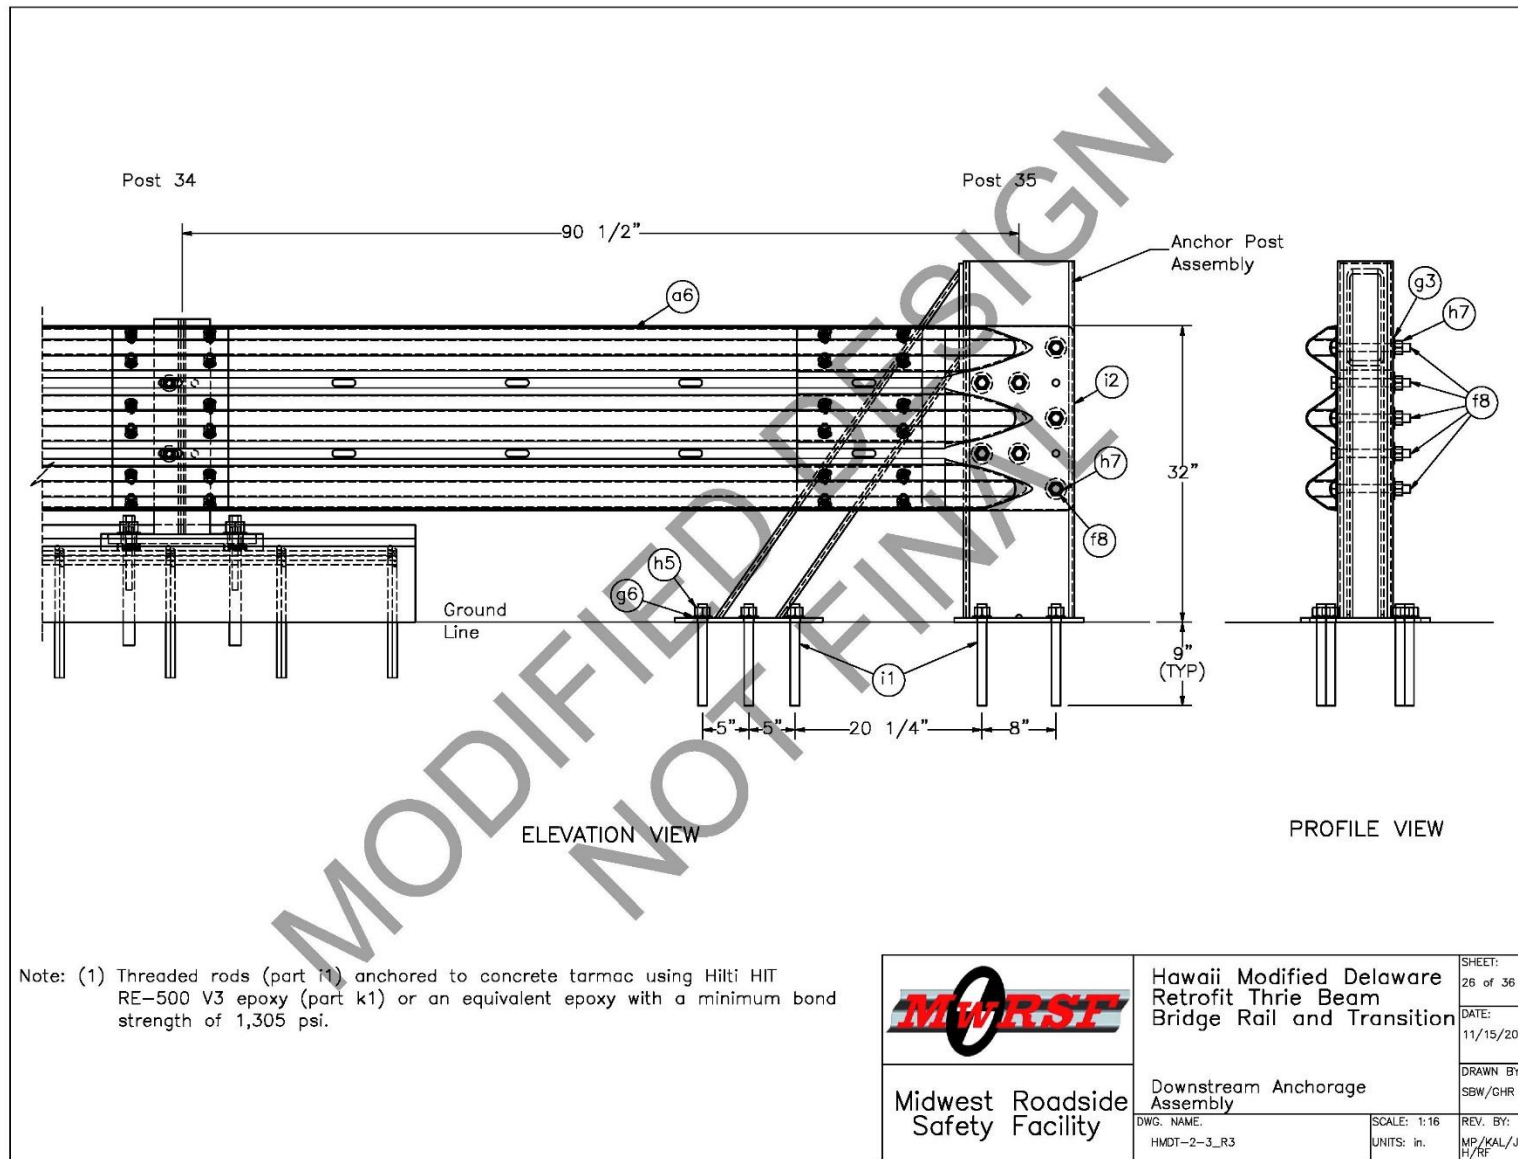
Downstream Anchorage Assembly, Test Nos. HMDT-2 and HMDT-3
